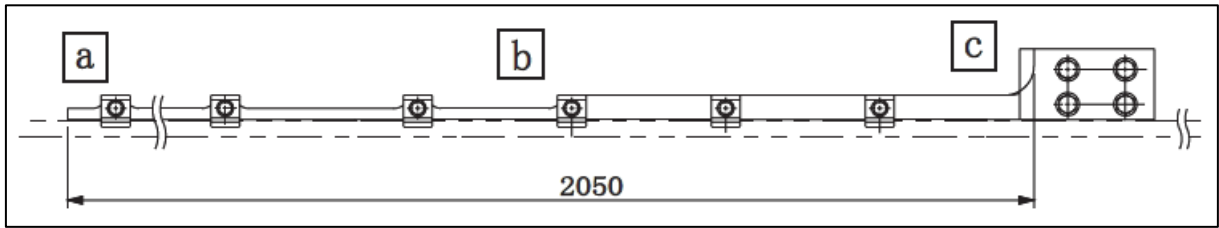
Arrangement of a Japanese conductor beam transition structure from (Kobayashi *et al.*, 2008b)
